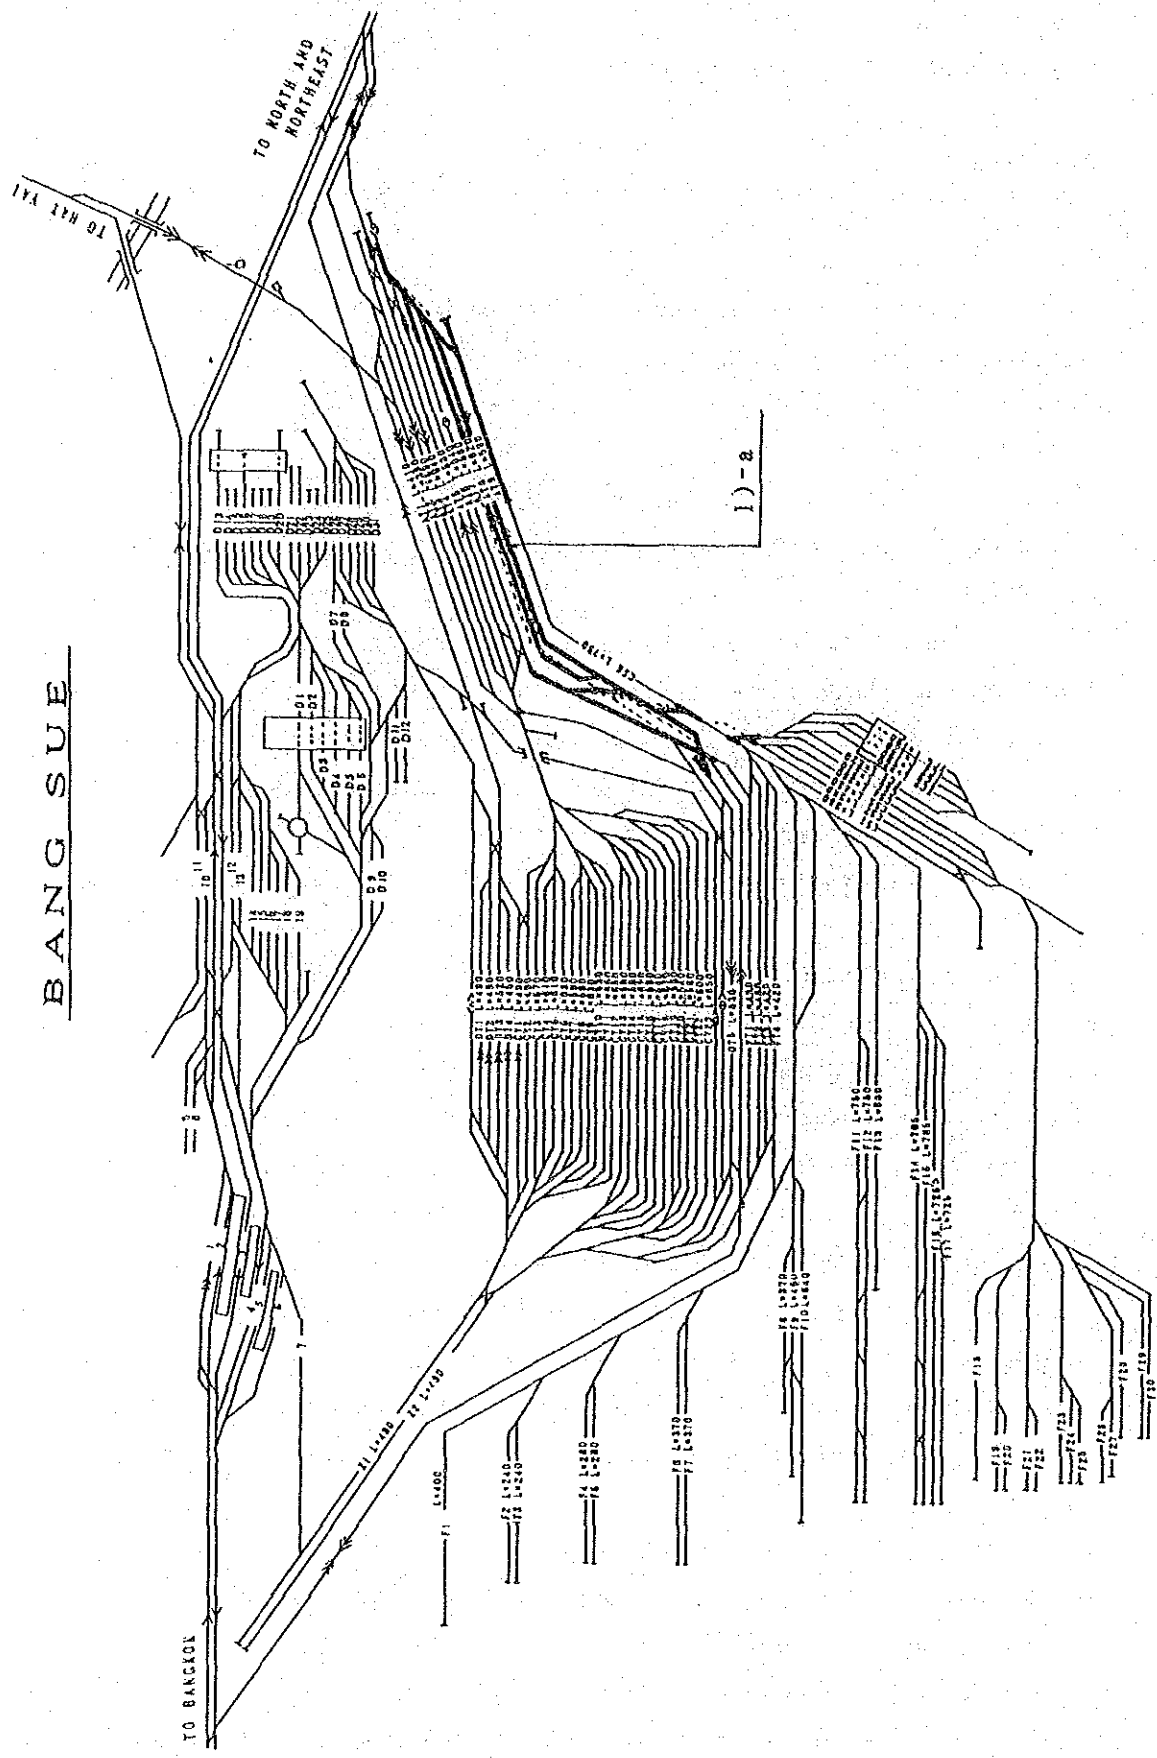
Future Track Layout at Bang Sue Station (F/S Plan)
